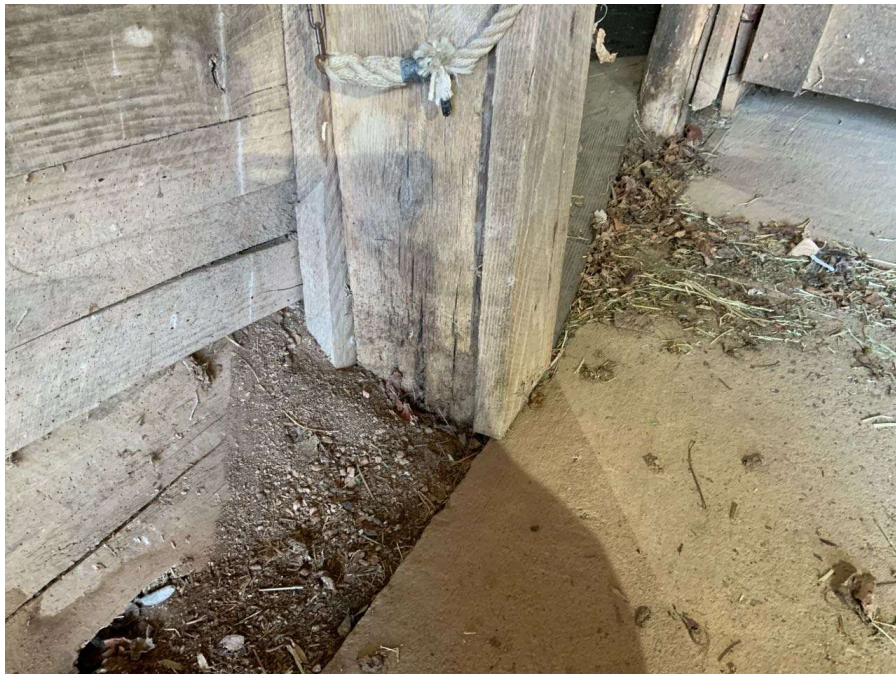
General view of a grade level column supported at finished grade. Column F/3 shown looking northwest.
